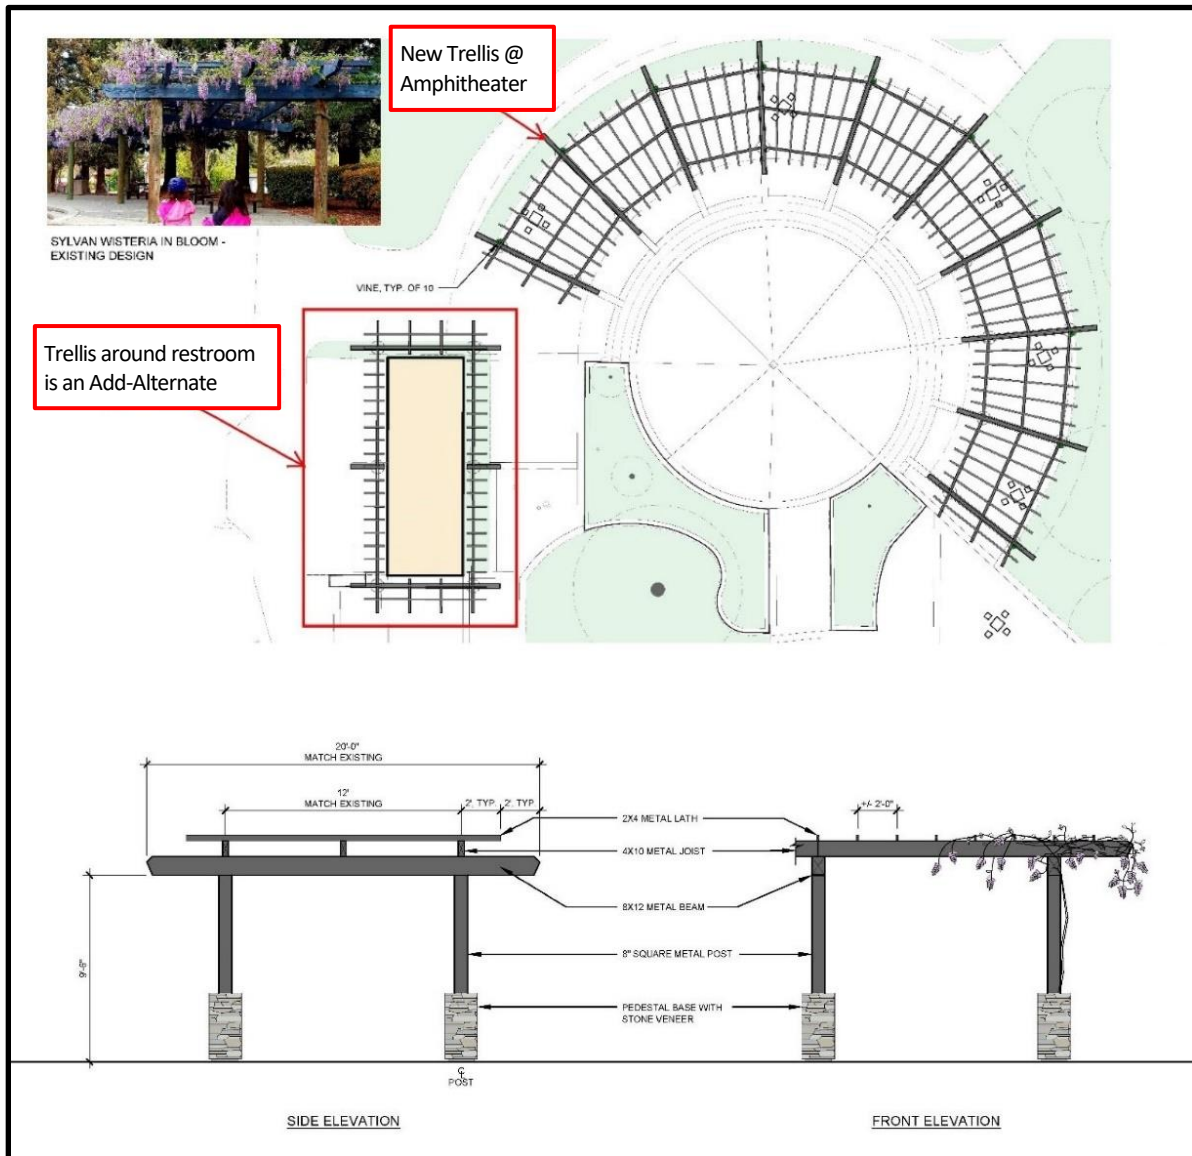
Trellis Conceptual Design Layout Plan and Elevation
